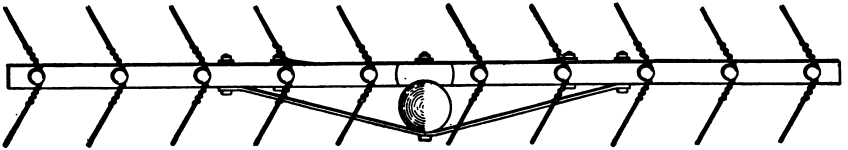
AERIAL LINE CONSTRUCTION, WIRES ON INSULATORS, CORNER POLE.
